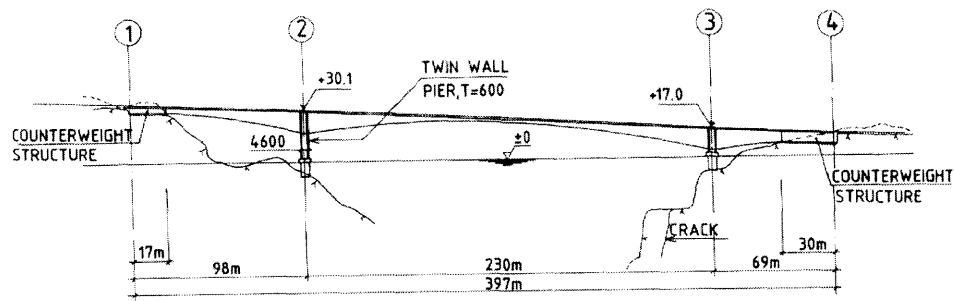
Norddalsfjord Bridge, elevation (Gjaever, 1987)
